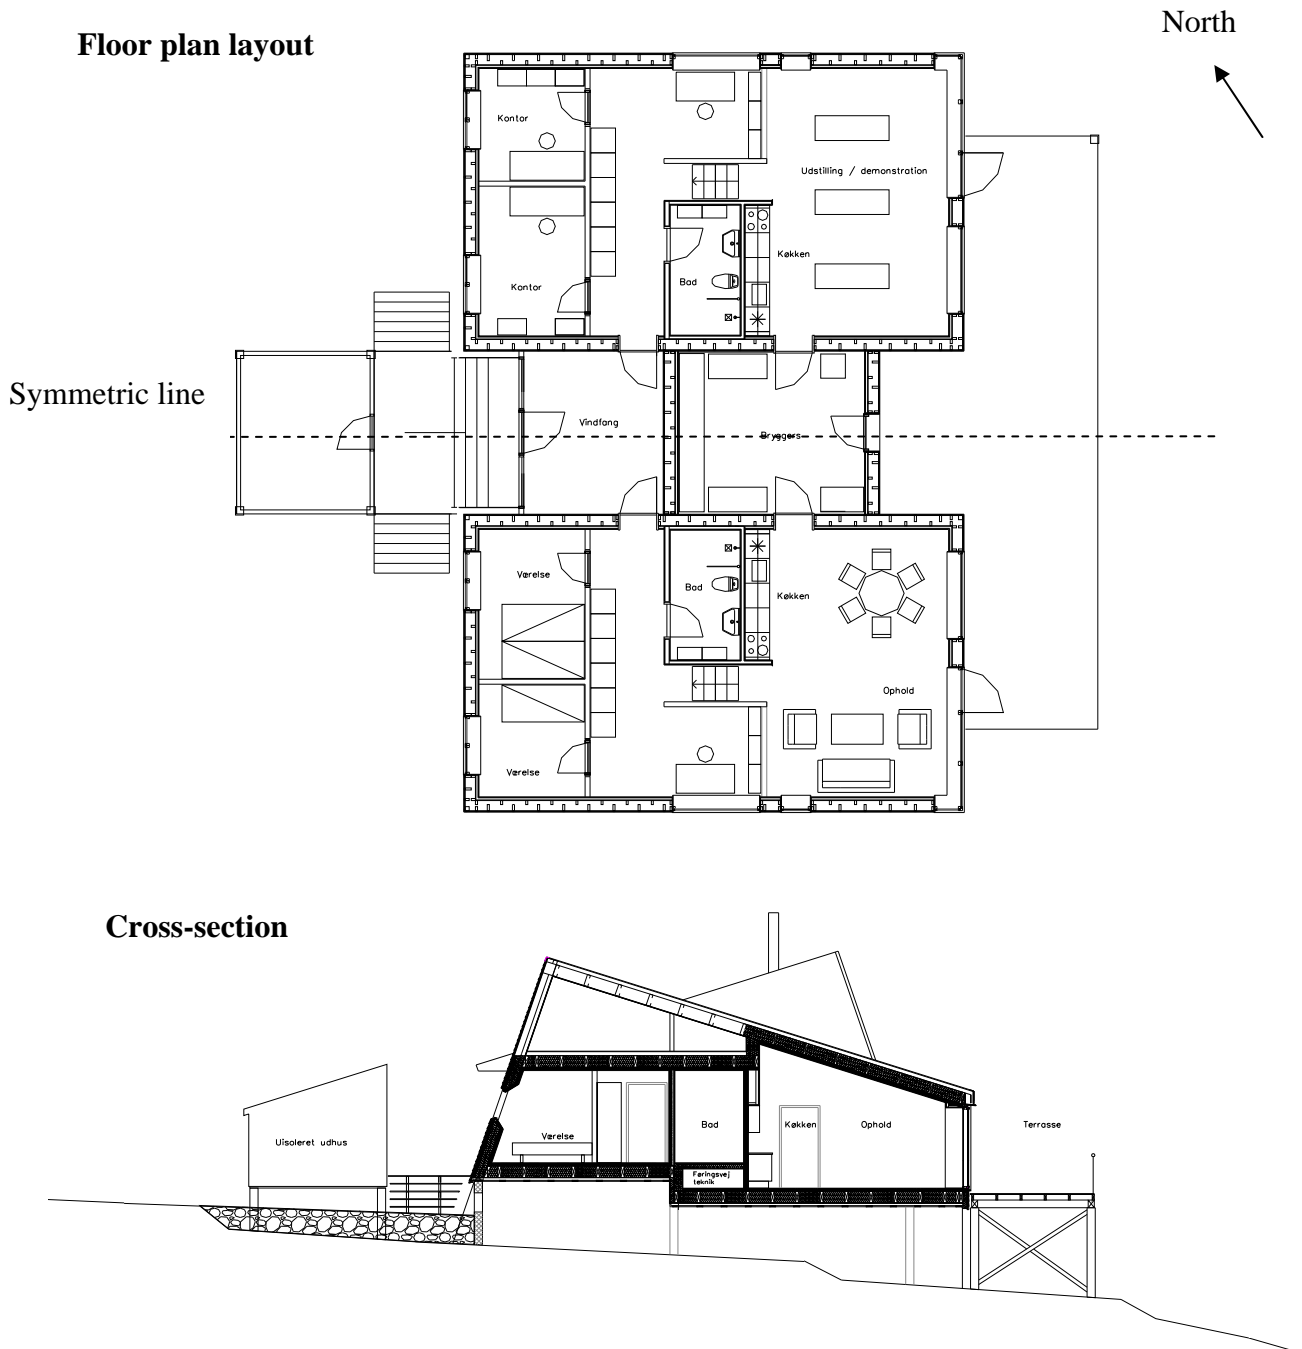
Low-energy house layout and cross section. The house is divided in two apartments, one serves as accommodation for a family and the other one as demonstration / guest house.
